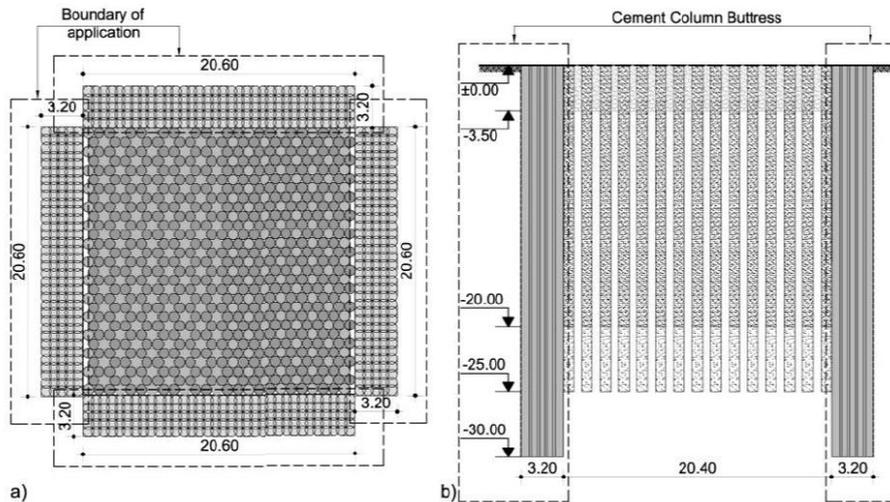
Soil deep mixing piles: (a) plan view, and (b) elevation
